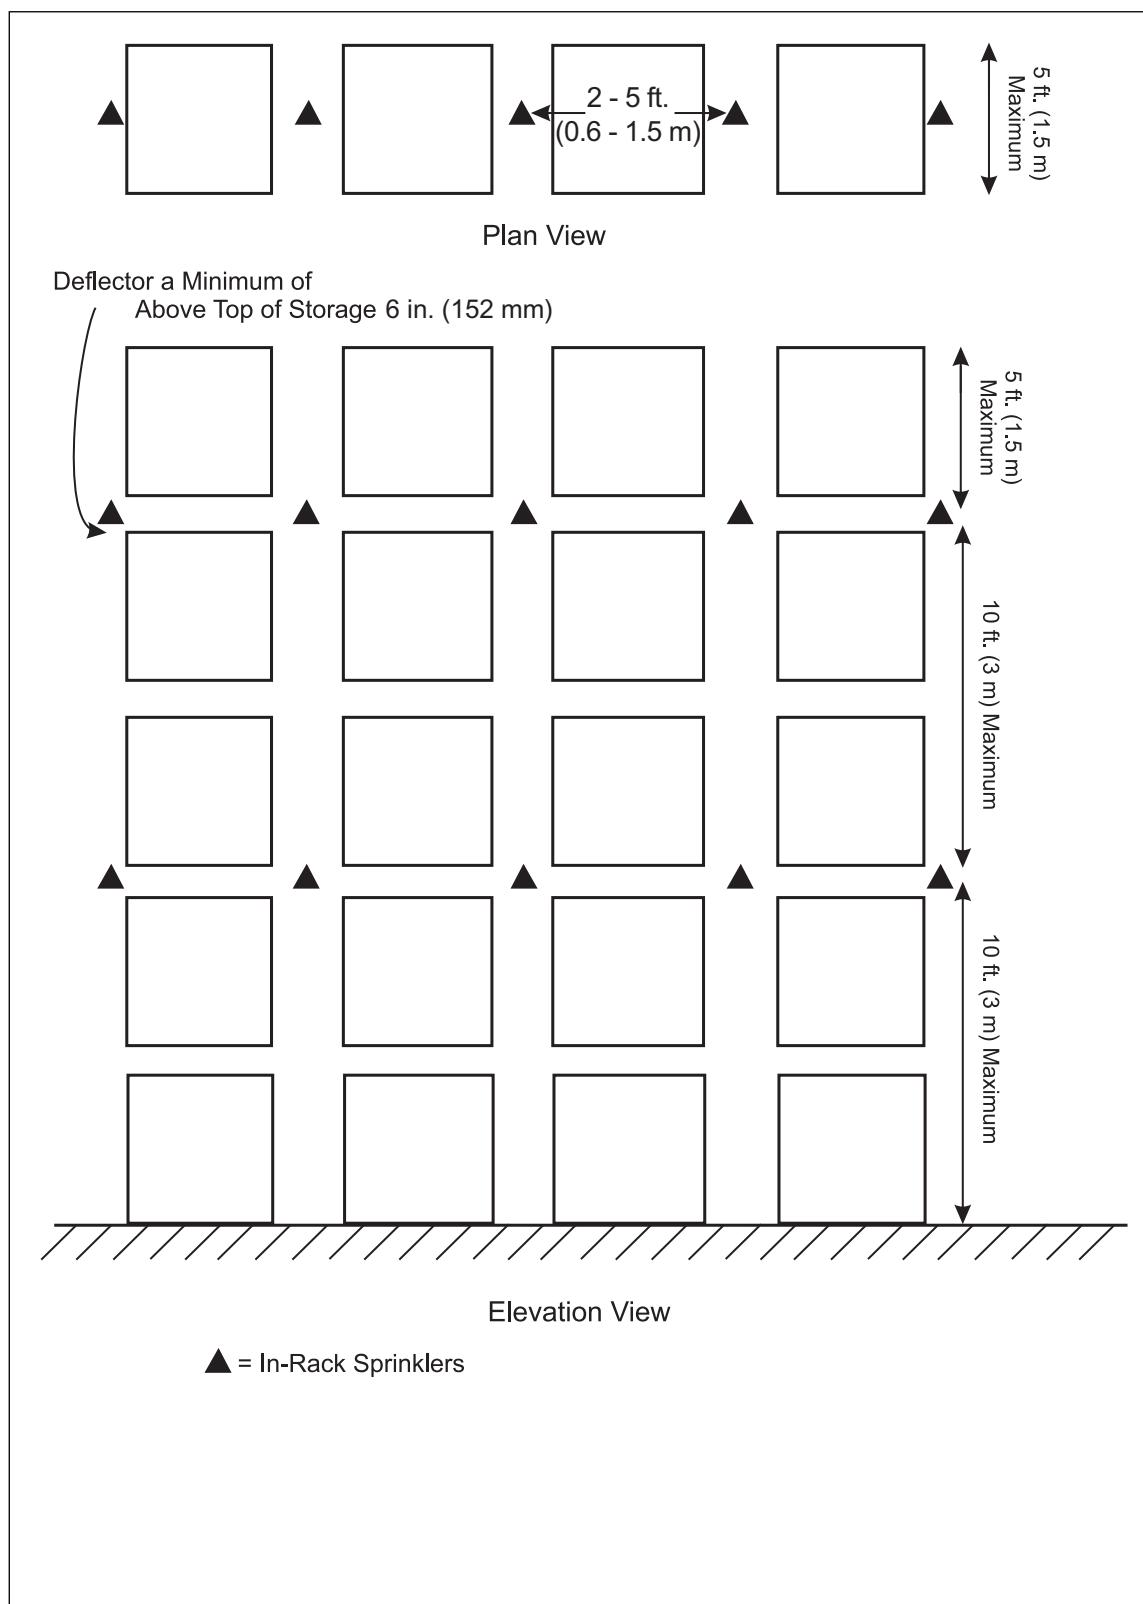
Single-row rack sprinkler layout: fire protection scheme B
